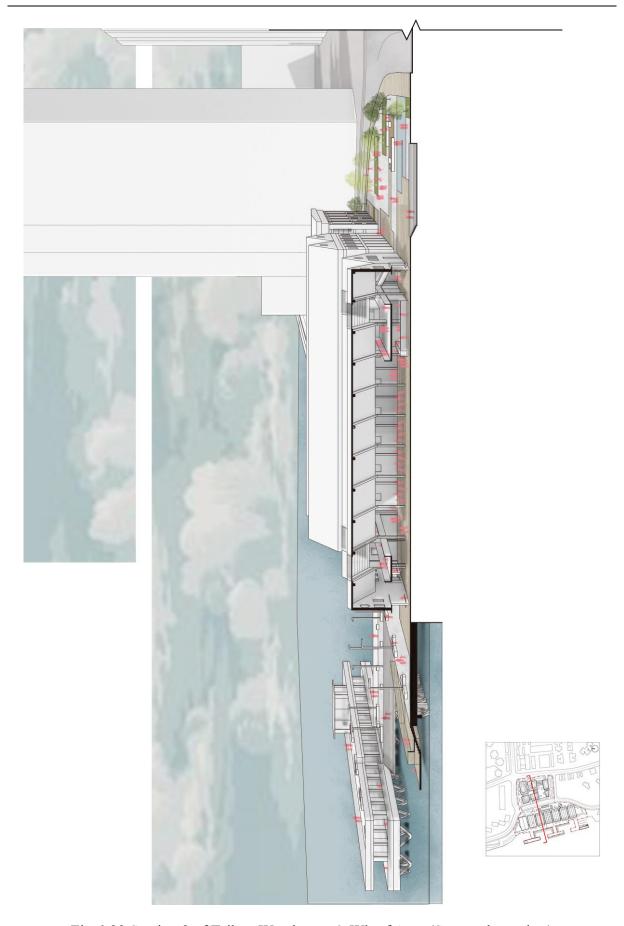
Section 2 of Taikoo Warehouse & Wharf Area (Source: by author)
